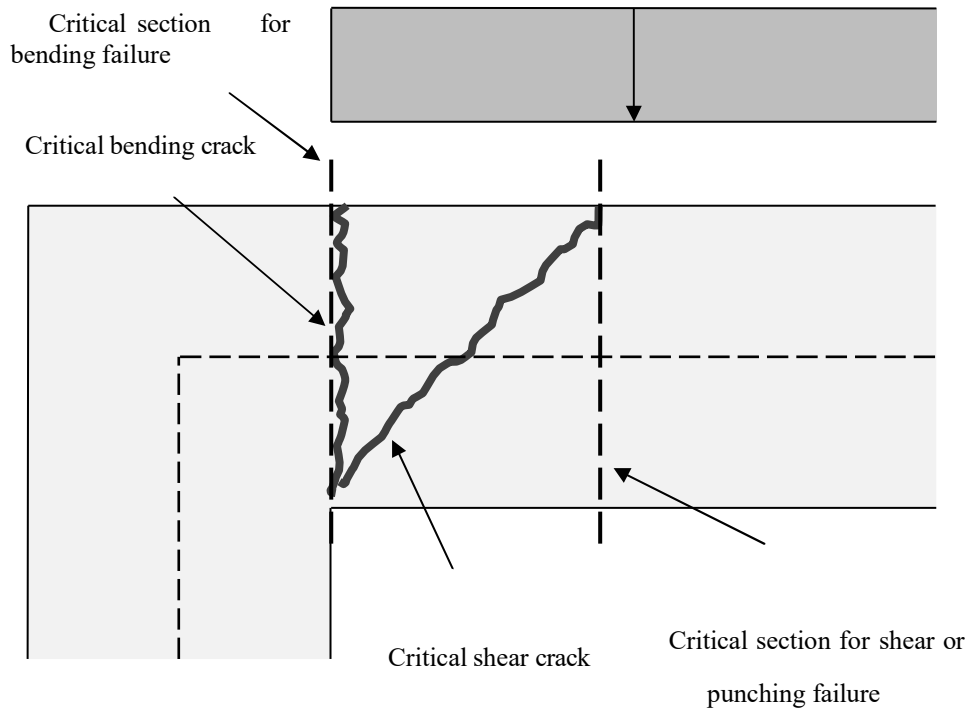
Illustration of critical sections at a support region of a frame corner loaded on the top surface.
